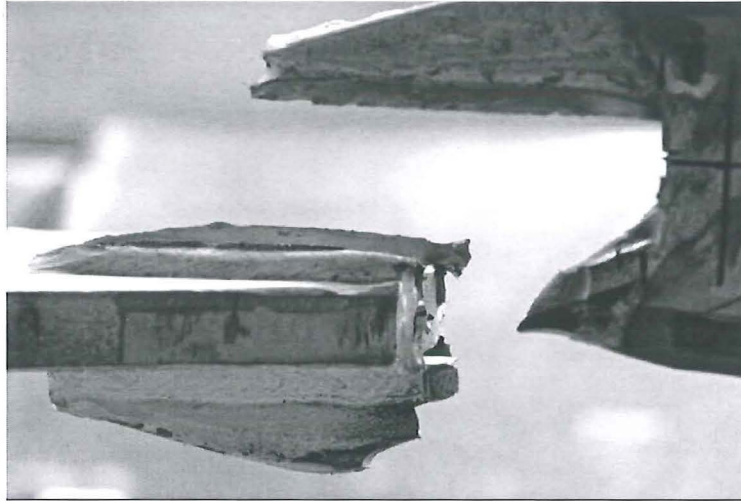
, 53.11 and 53.12: Different side views of the test specimen after failure.
